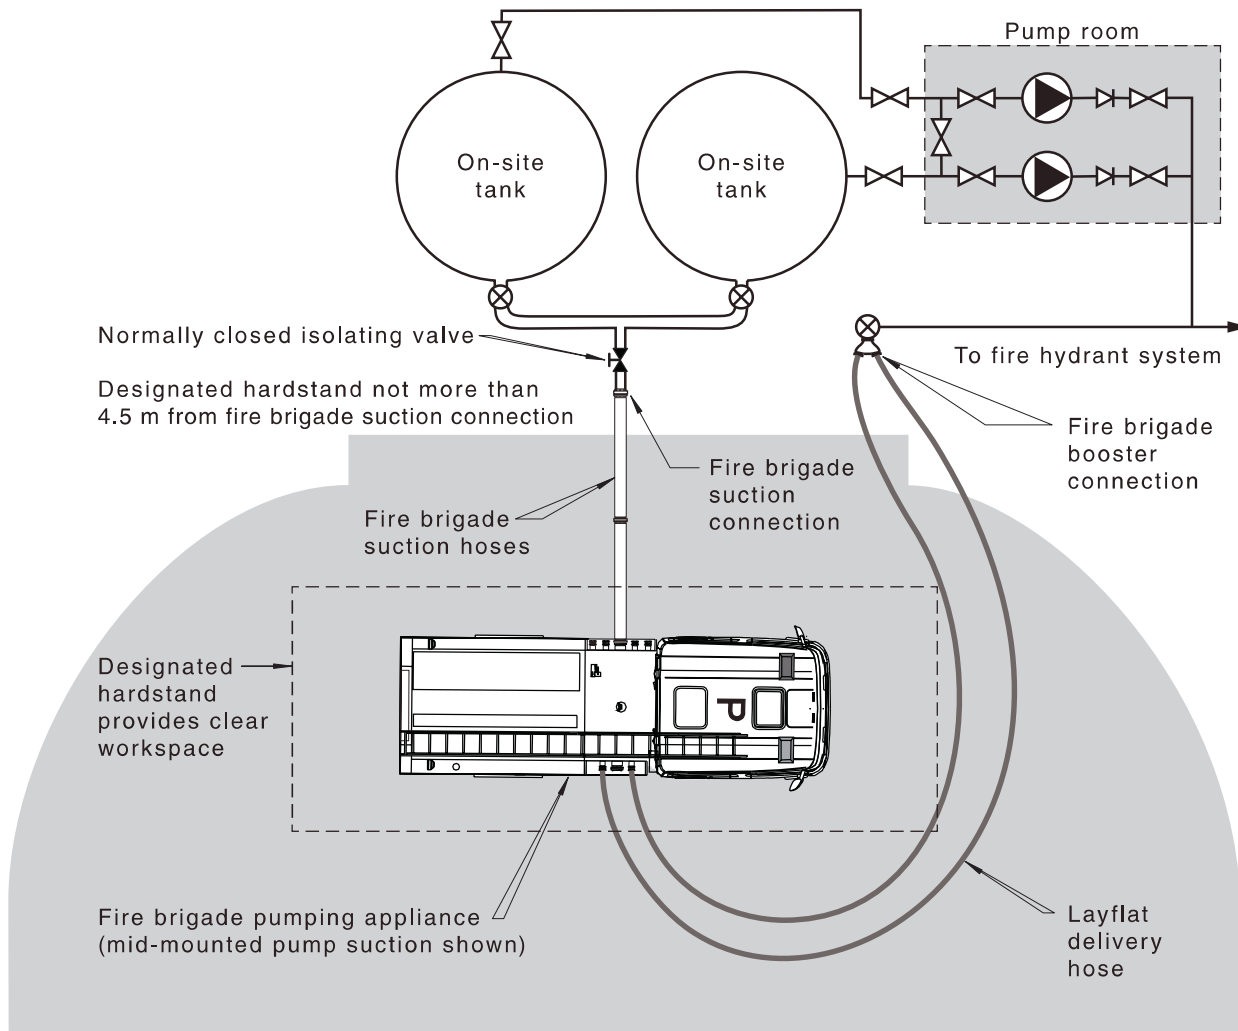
(C) — Mid-mounted fire brigade pumping appliance draughting from an on-site water storage tank
